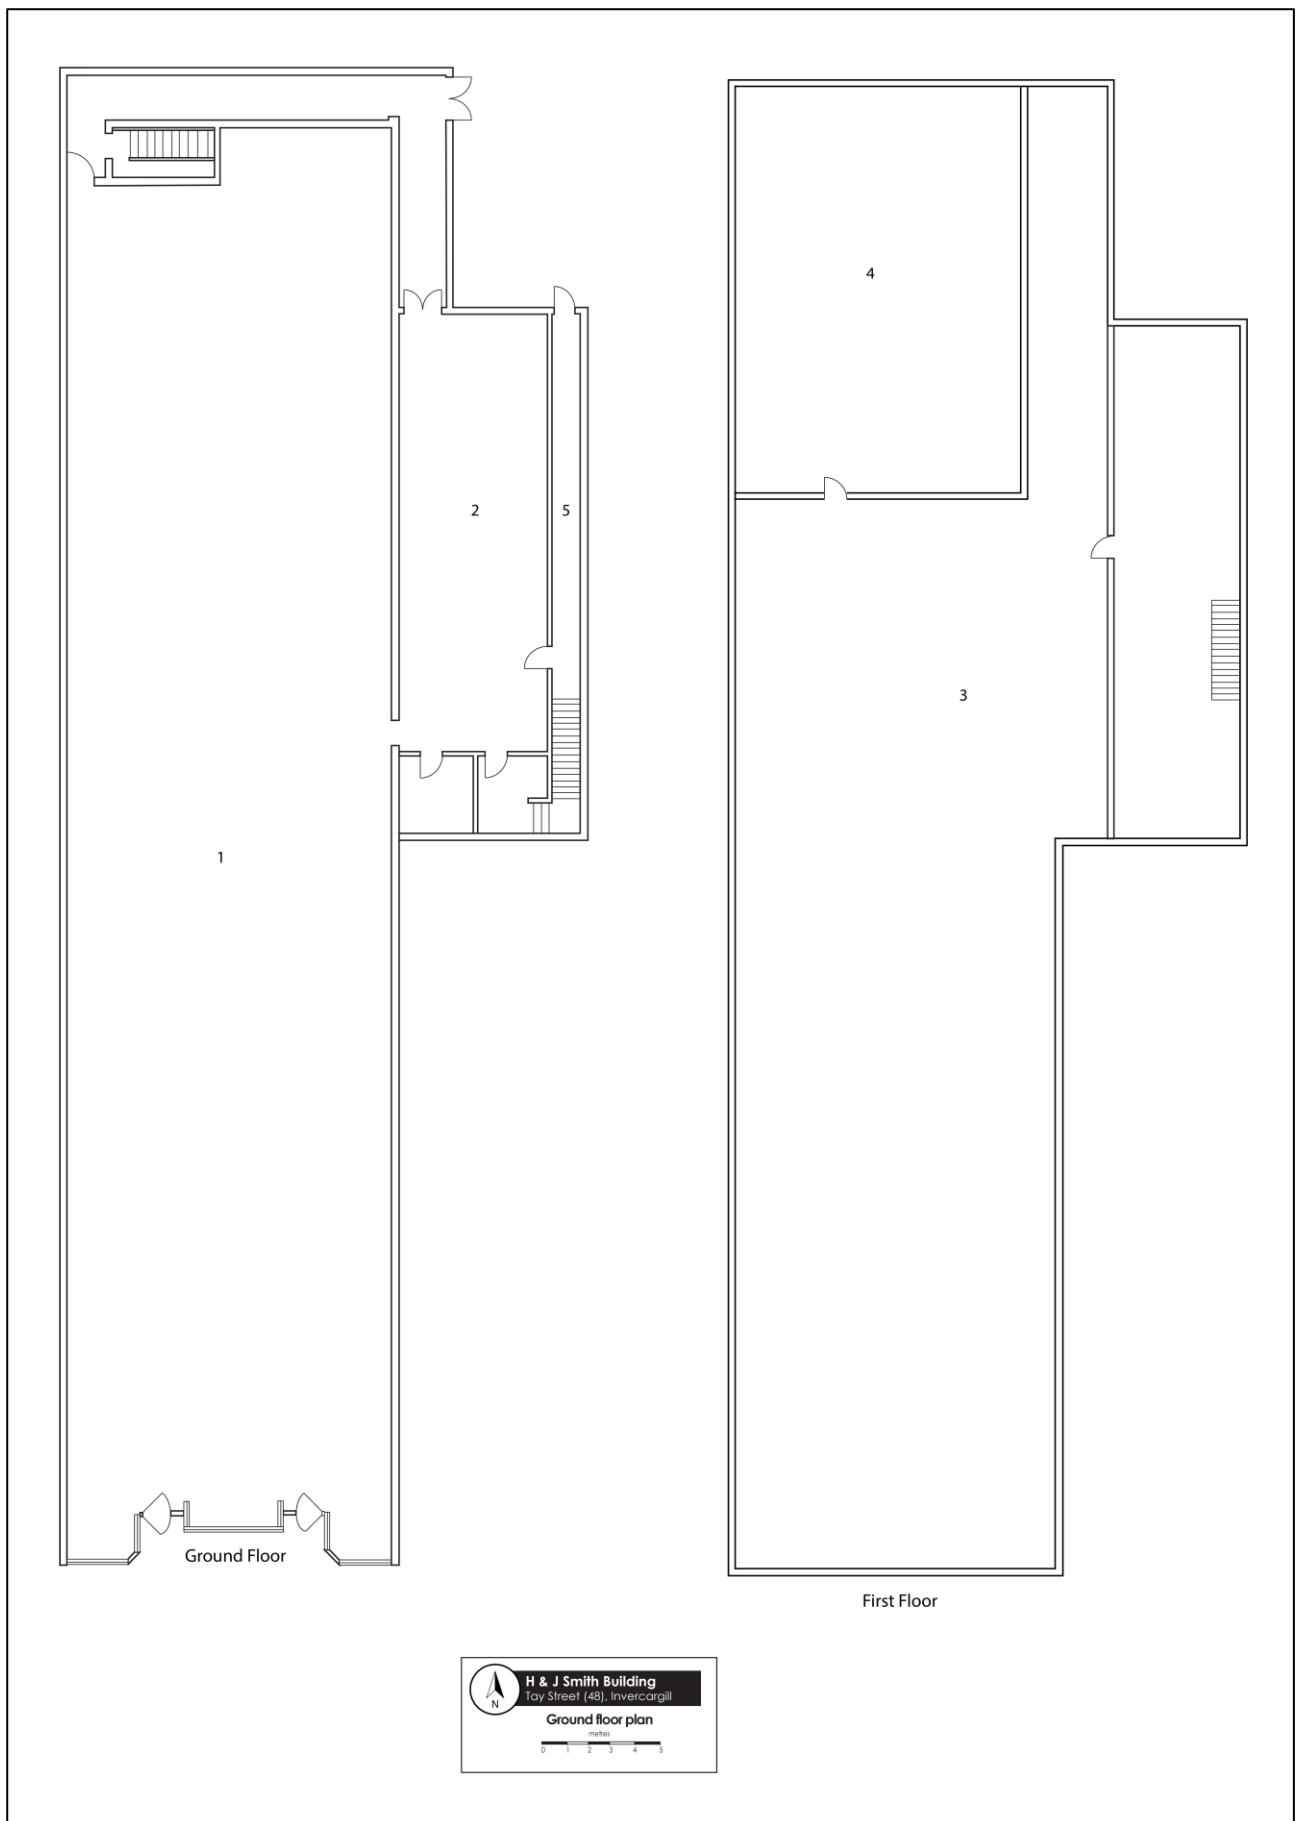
Ground and first floor plan of the H & J Smith Building recently occupied by MacPac.
